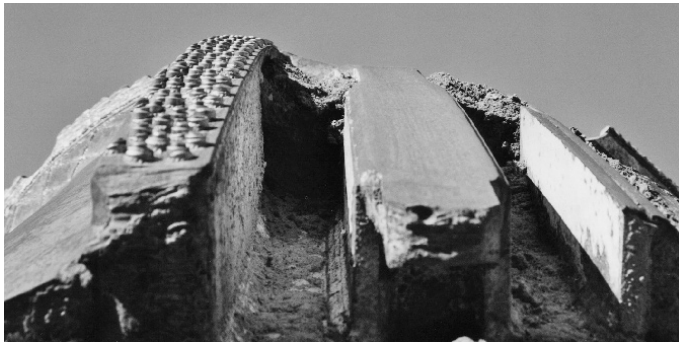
Section of the rim of the cutterhead Murgenthal Tunnel TBM.
